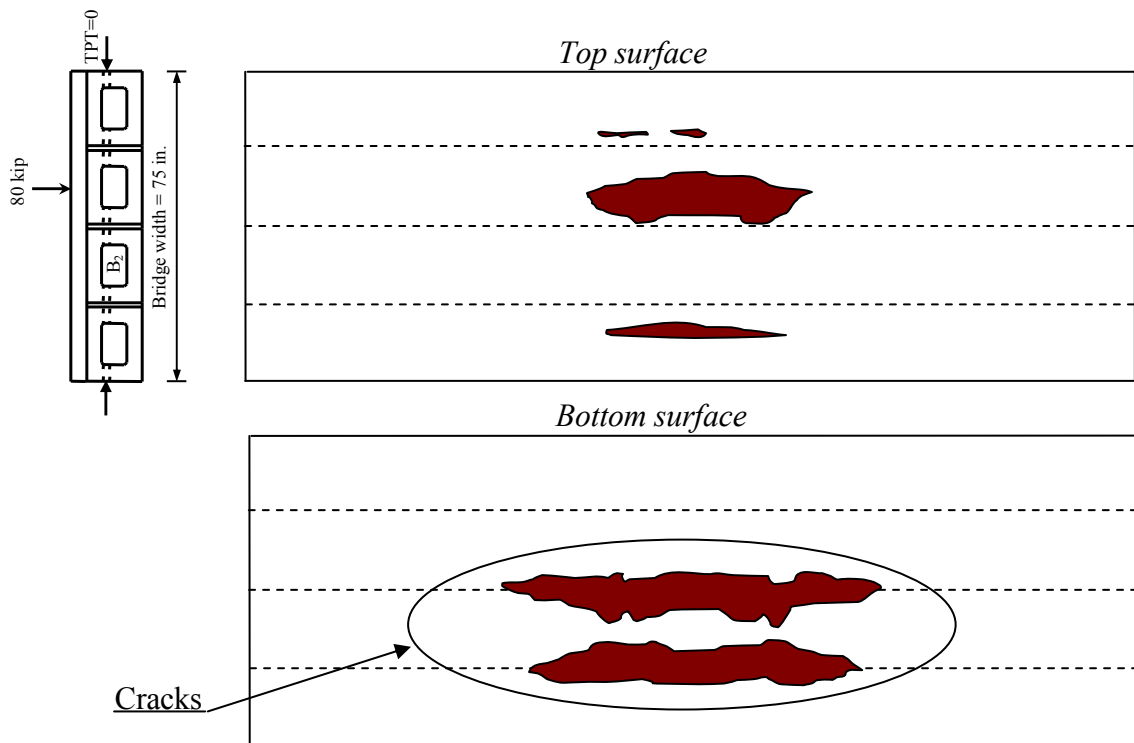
Crack development in the slab under vertical load of 80,000 lb.
